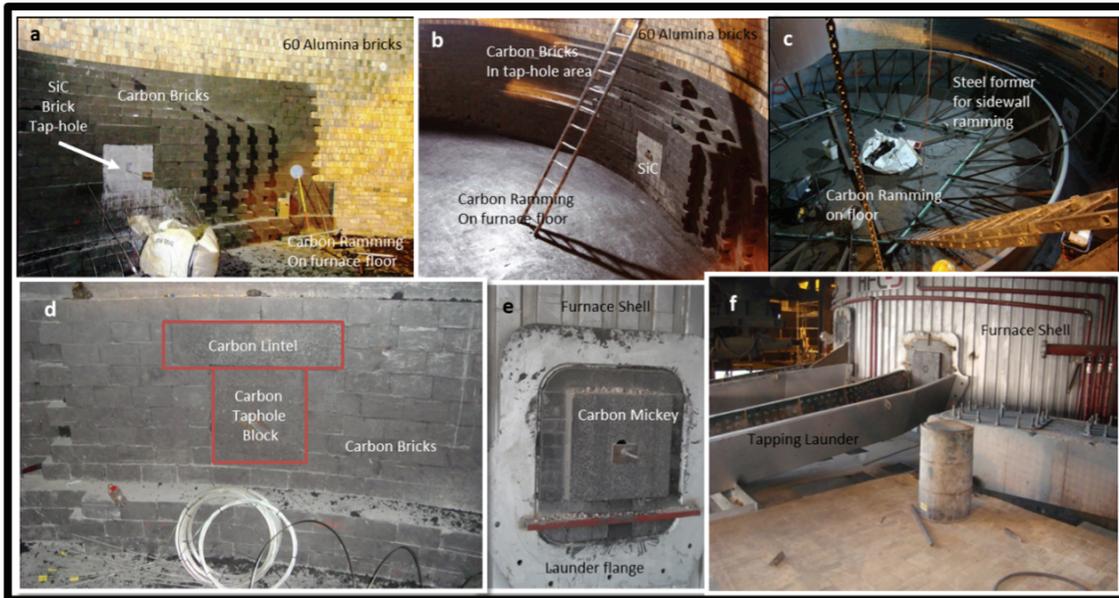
(a) Inside of tap-hole showing the staggered design of graphite bricks and a SiC brick tap-hole; (b) sacrificial carbon ramming on hearth and carbon tap-hole wall before sidewall ramming is installed; (c) former for sidewall ramming installed; (d) carbon tap-hole showing carbon tap-hole block and carbon lintel; (e) outside view of carbon tap-hole showing carbon mickey installed; (f) water cooling channels on furnace shell, front mickey, and launder design.
